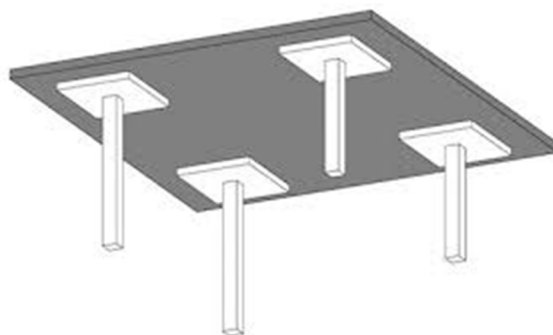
Typical shape of Reinforced Concrete Flat Slab with drop panel
